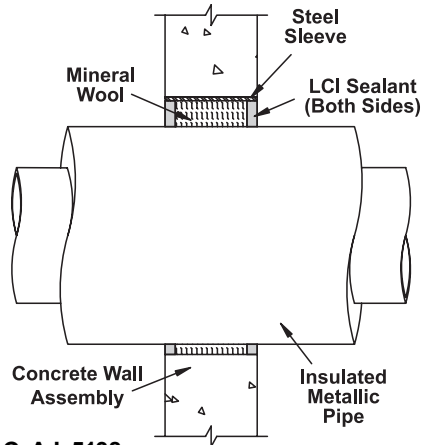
INSULATED METALLIC PIPES - Concrete/Masonry Floors & Walls
